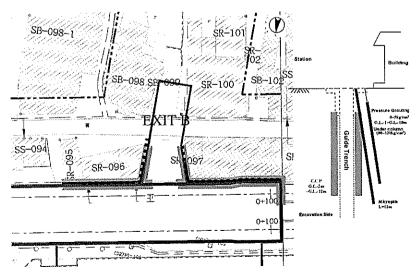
Location Plan of Fu-Ta Station, Case Two
